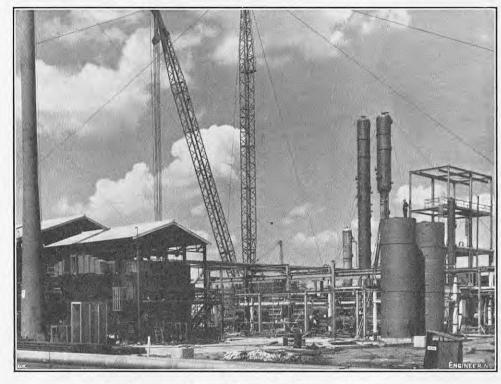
Furfural Solvent Unit; Lubricating-Oil Section.
